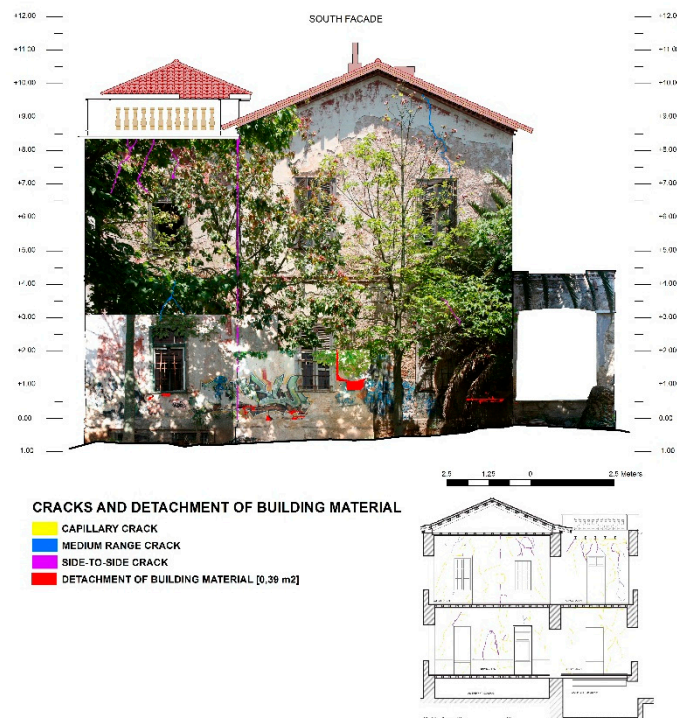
Thematic map of cracks and detachment of building materials depicted on the south façade of the building.
